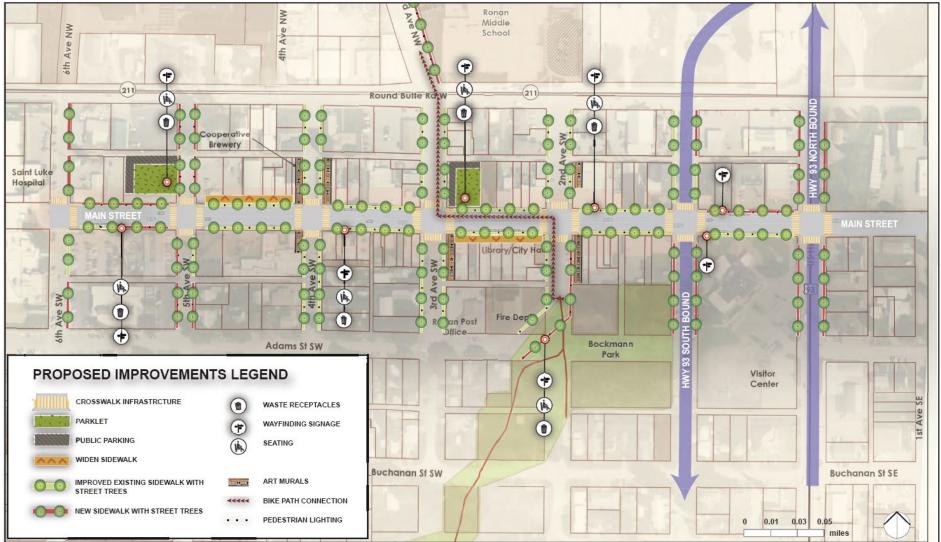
MAIN STREET SITE PLAN W/ PROPOSED IMPROVEMENTS (CONCEPTUAL)
